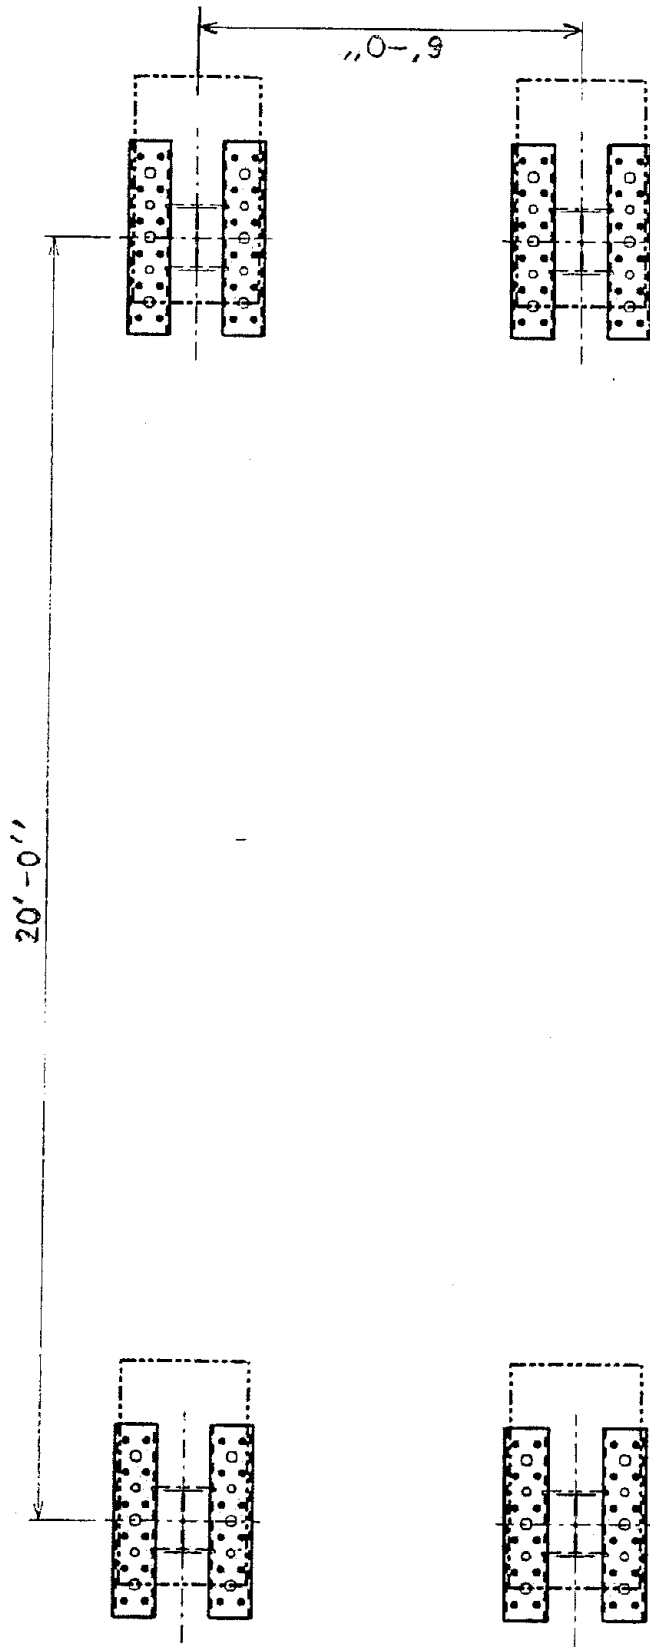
Load frame foundation supports showing four embedded channels (1'=305 mm, 1''=25.4 mm)
